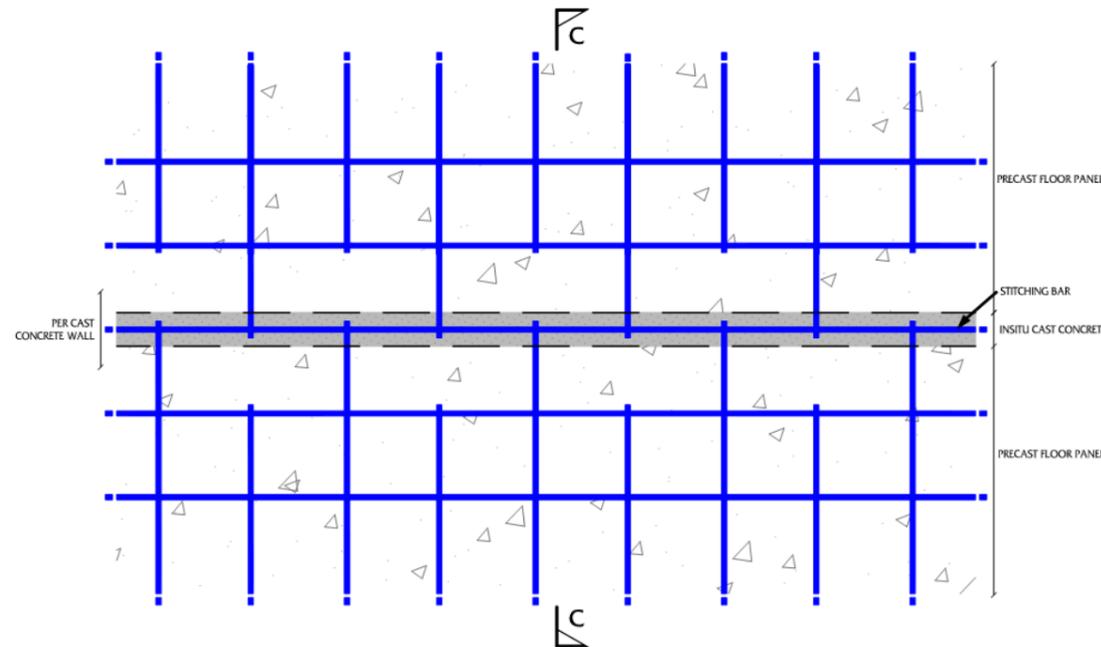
plan of connection between adjacent floor panels (from GBG report)
